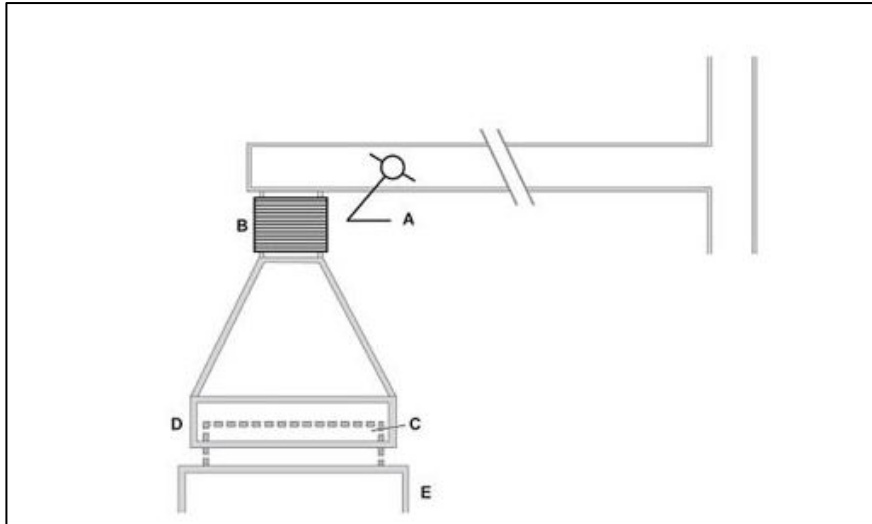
MSC Class II A1 or A2. A) Balancing damper, (B) Flexible connector to exhaust system, (C) Cabinet exhaust HEPA filter housing, (D) Canopy unit, (E) Bench.
